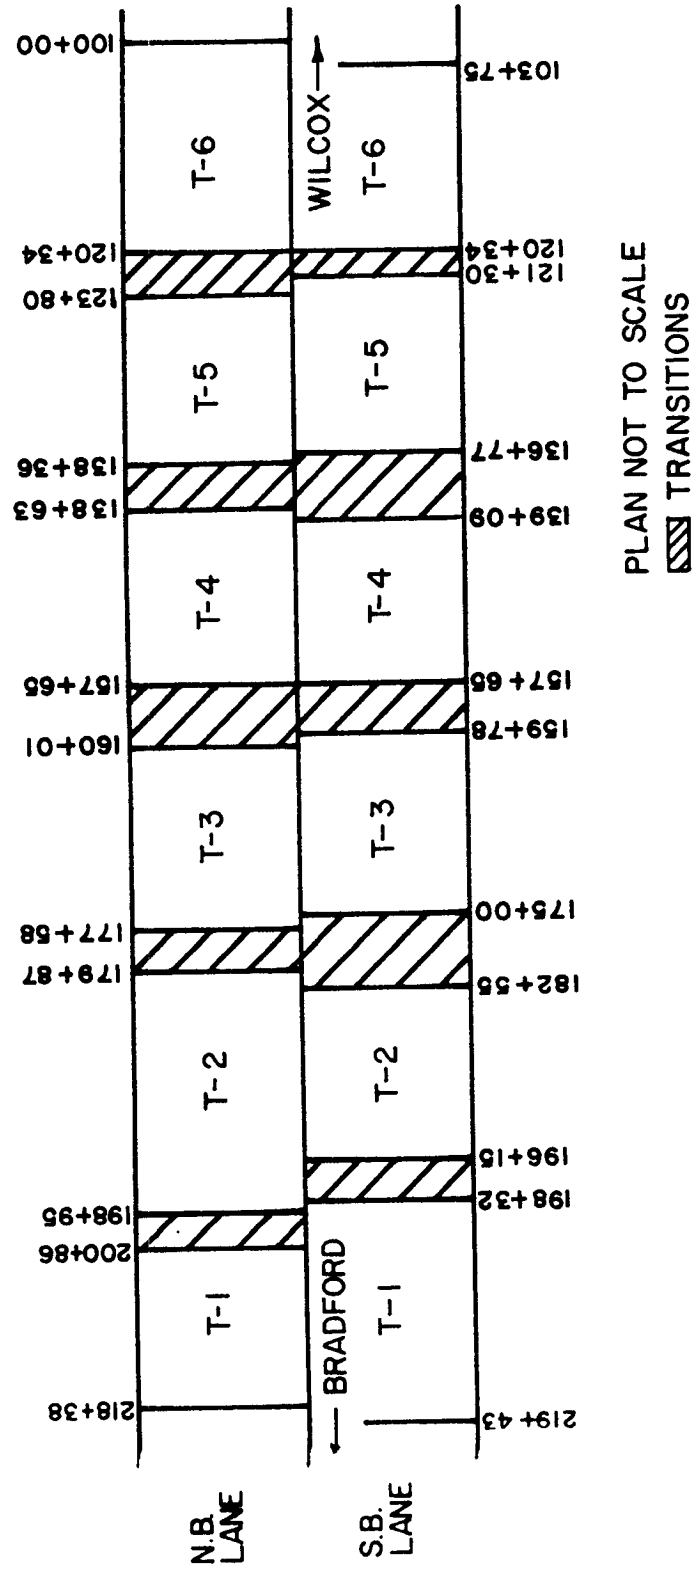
Pennsylvania test sections (stations are given in feet)
